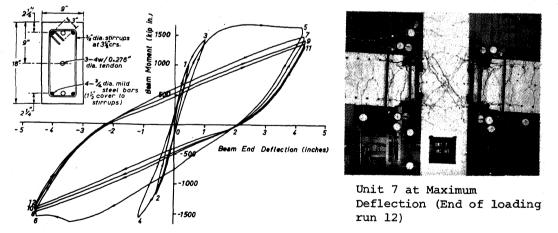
Unit 7: Beam Moment at Column Face Versus Beam End Deflection.
